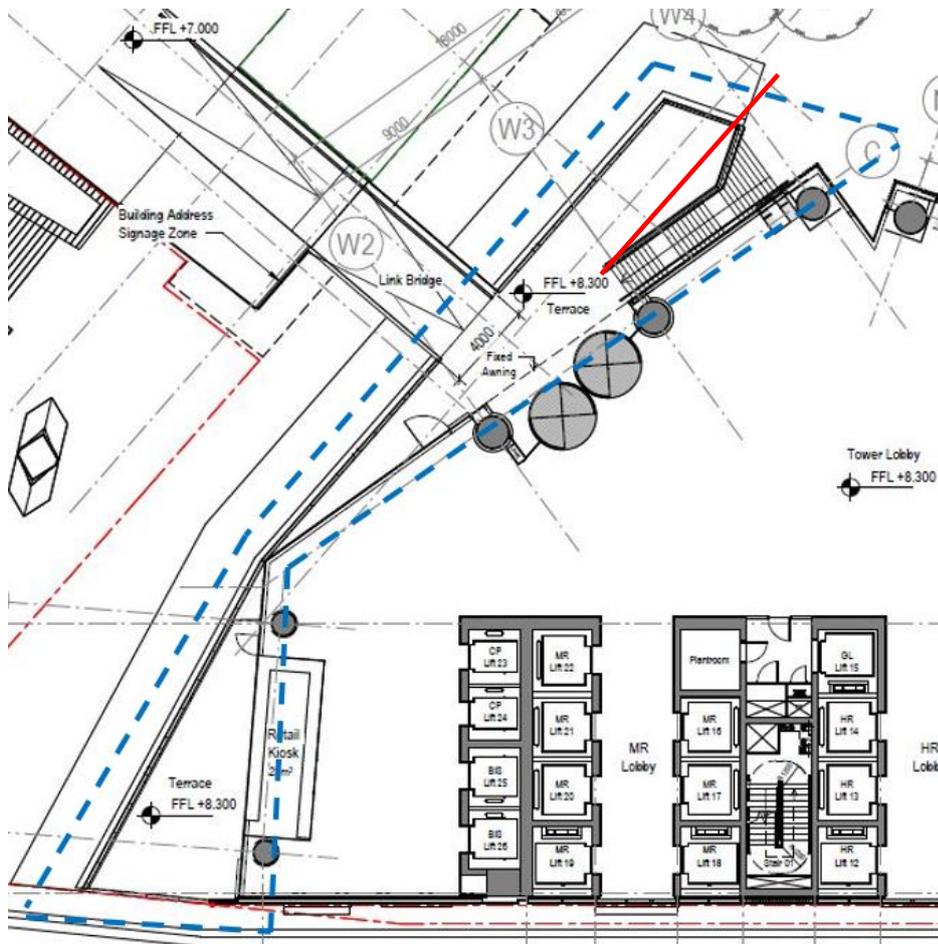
George Street lobby level with terraces outlined and indicative stair adjustment.
